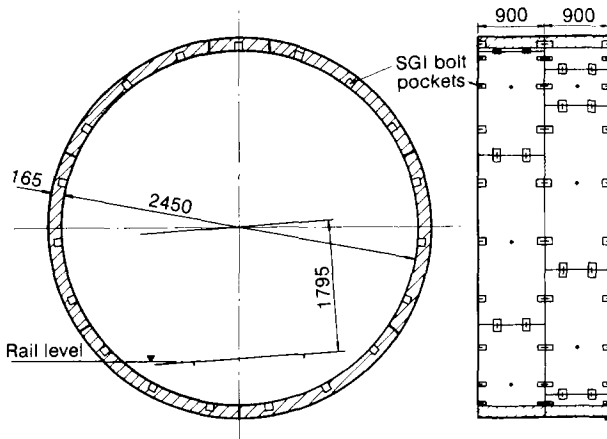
Precast concrete segmental lining, 4.9 m i.d. (dimensions in millimetres)
